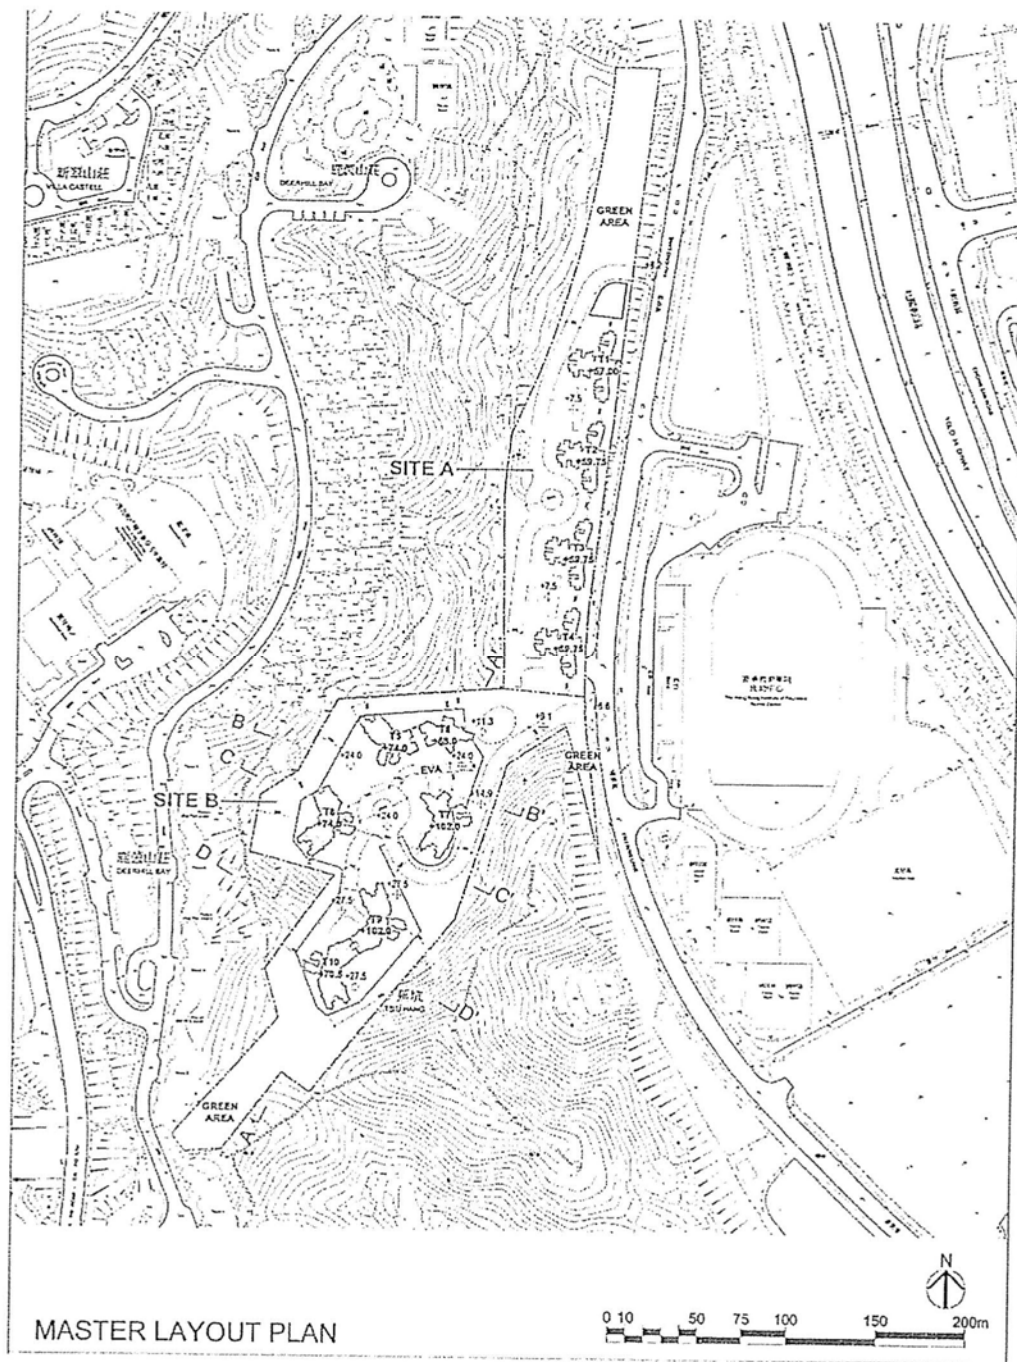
An Illustrative Scheme (Master Layout Plan) at PR 2.1
